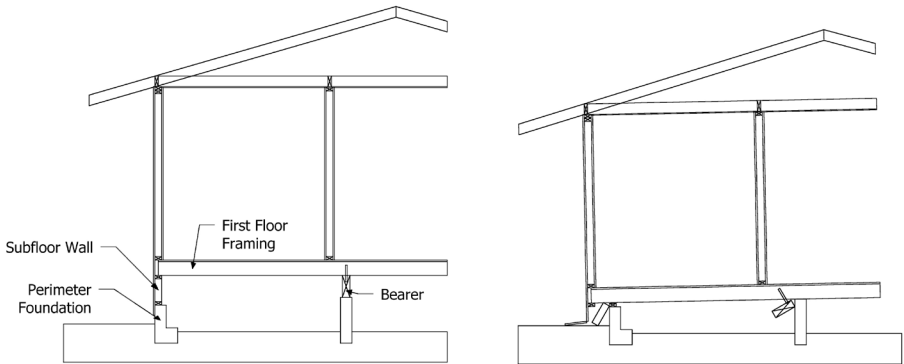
Housing subfloor structure; the view on the right shows the house slipped off the foundations
